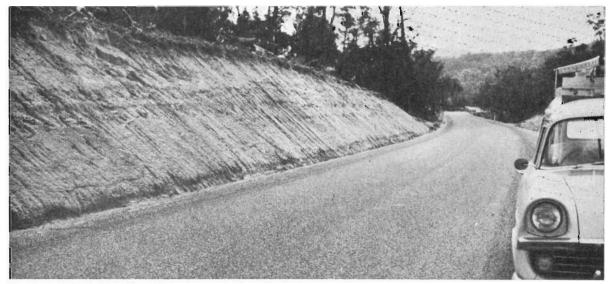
Princes Highway East, Section 6. West of Genoa after reconstruction. Orbost Shire.
